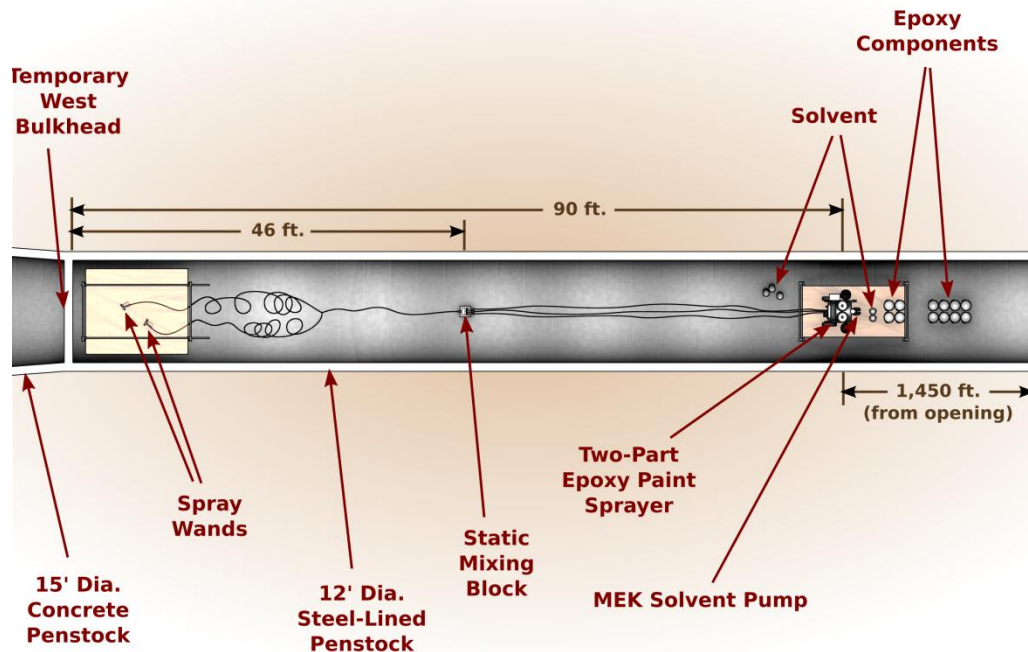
Aerial view of equipment arrangement in work area of the penstock
